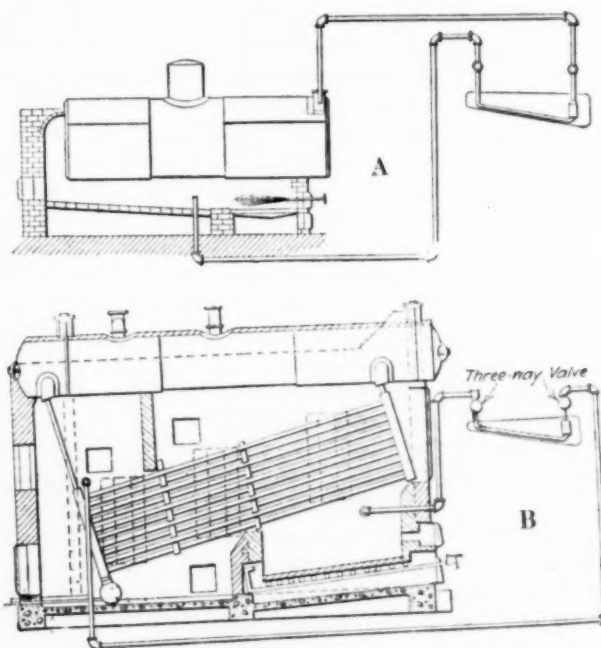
PROPER CONNECTIONS OF DRAFT GAGES ON OIL-BURNING BOILERS
